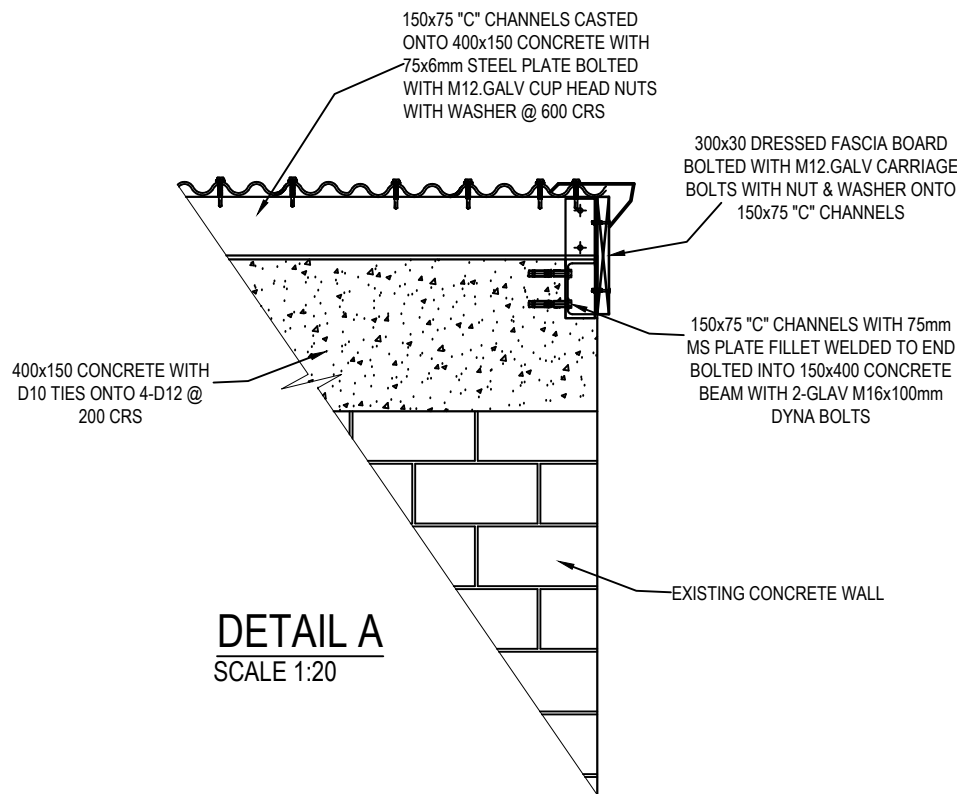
INTERNAL WALL TO ROOF DETAIL
